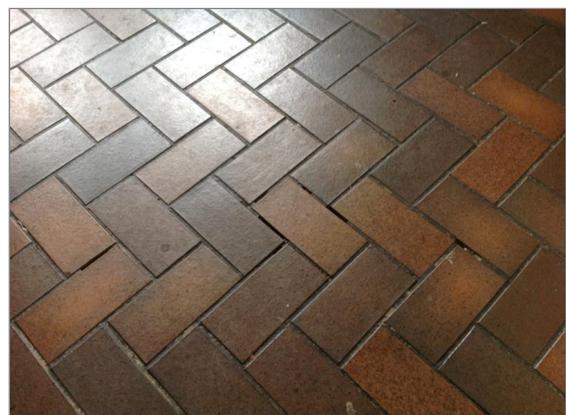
Gaps to joints of clay brick sets in kitchen floor
